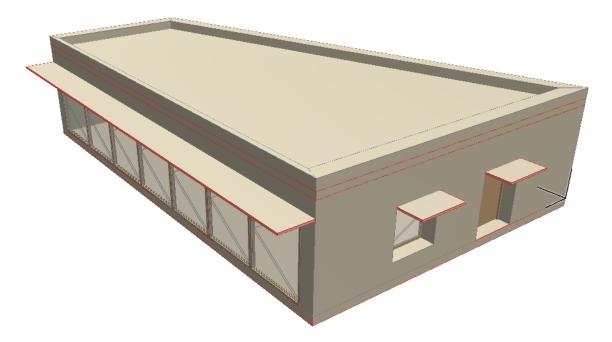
One Story Non-rectangular Building with Curtain Wall and Shading Devices
